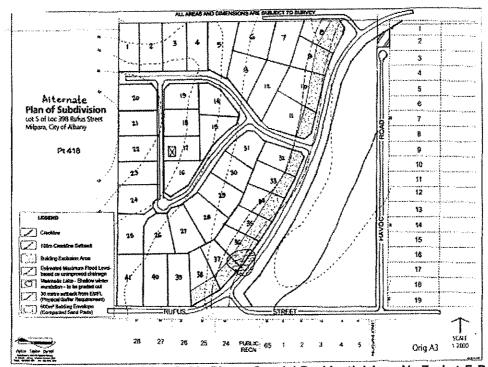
Alternate Subdivision Guide Plan - Special Residential Area No.7 - Lot 5 Rufus Street.
